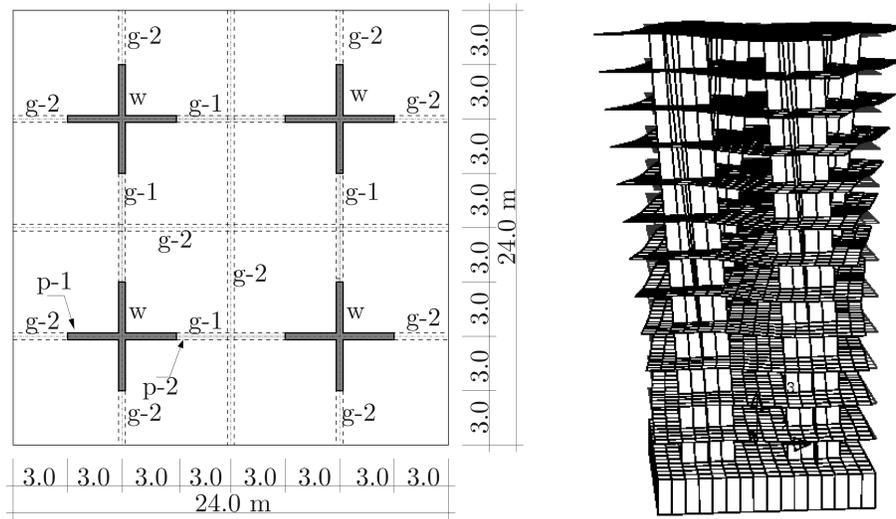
Left: Floor plan of twelve story building supported by concrete walls (w) and girders of type g-1 and type g-2. Critical strains are considered at positions p-1 and p-2. Right: First mode shape of displacements
